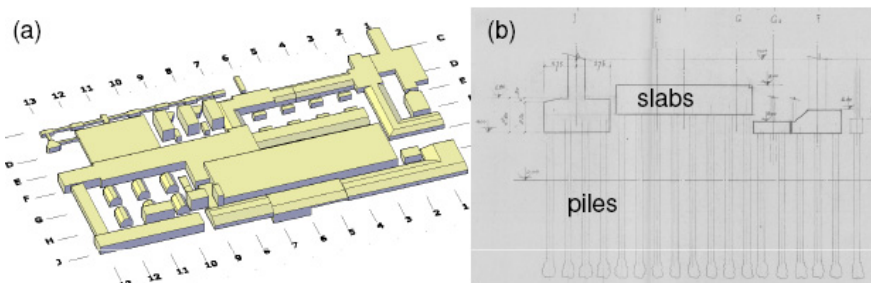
Foundation: (a) mats system, (b) typical foundation section.
